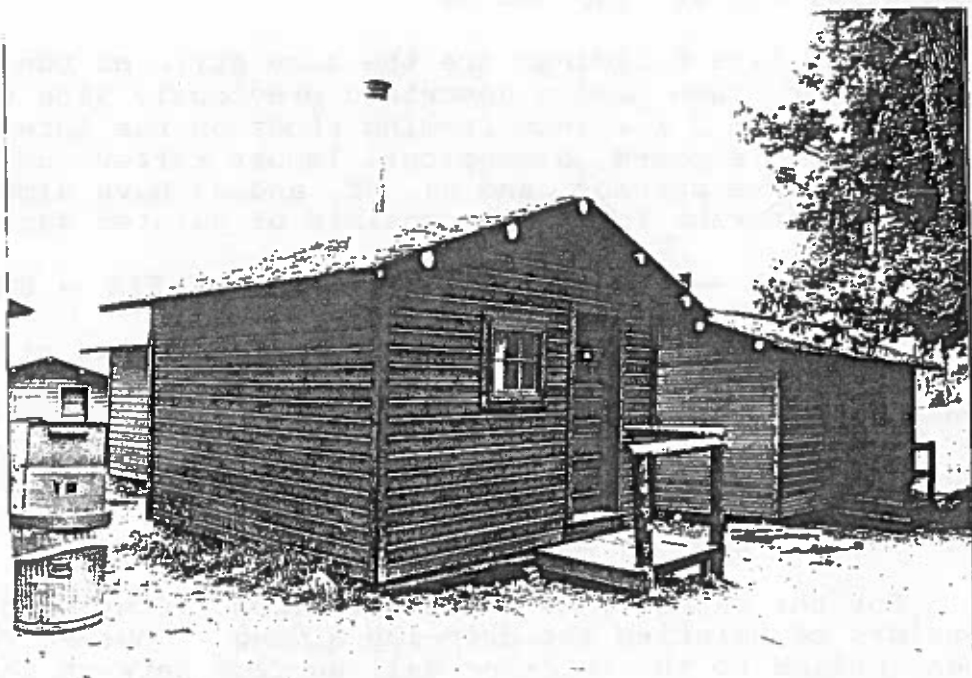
Looking north at cabin 61 a guest cabin in the west group of cabins. The roof is in poor condition, the porch needs work, and windows and doors need maintenance. Note the cracks in the corner boards.
